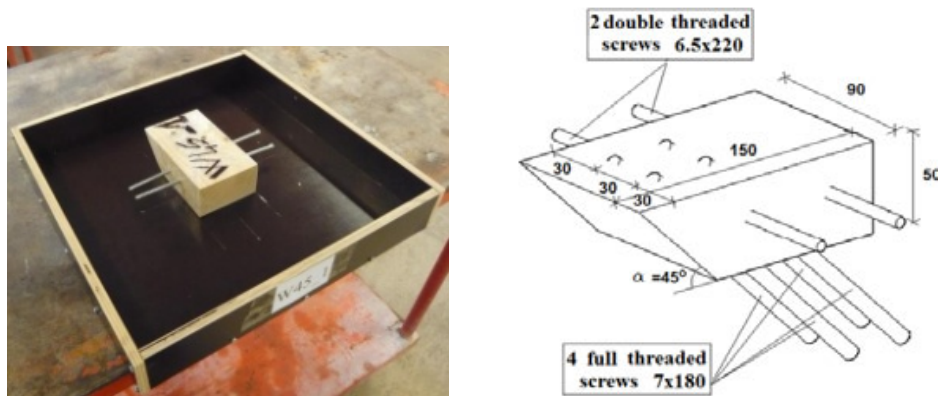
Wooden shear anchor-key type W45 before concrete casting on the left, while W45-type details are on the right.
